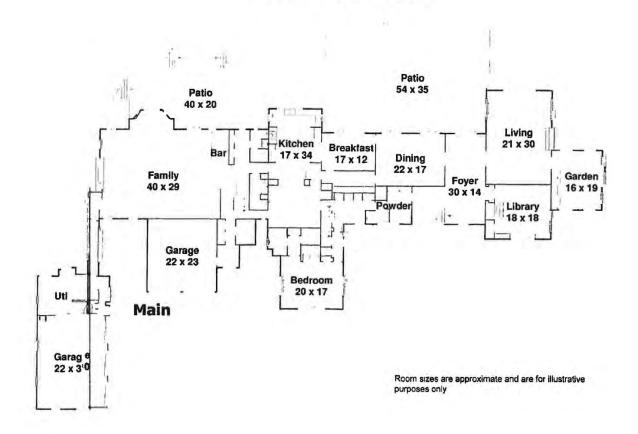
Existing First Floor Plan of the main residence at 5 Briar Lane provided by Highgate Builders. The plan is oriented west.
